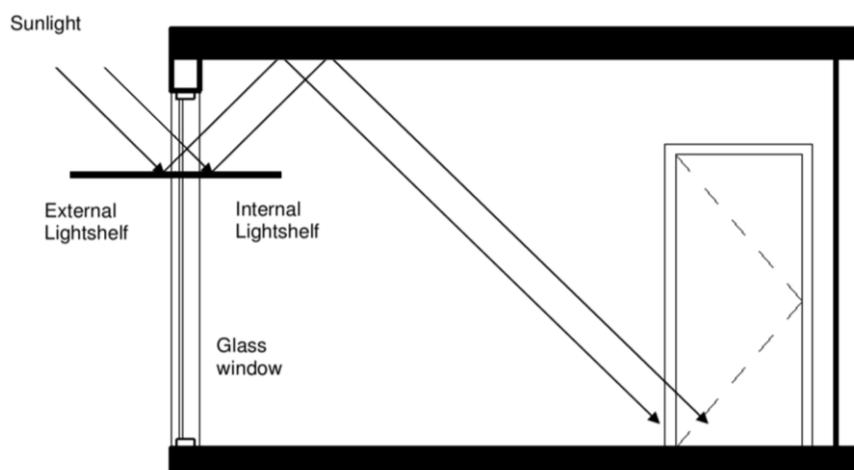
Light Shelf Strategy on Building Daylight (Author, 2021)
